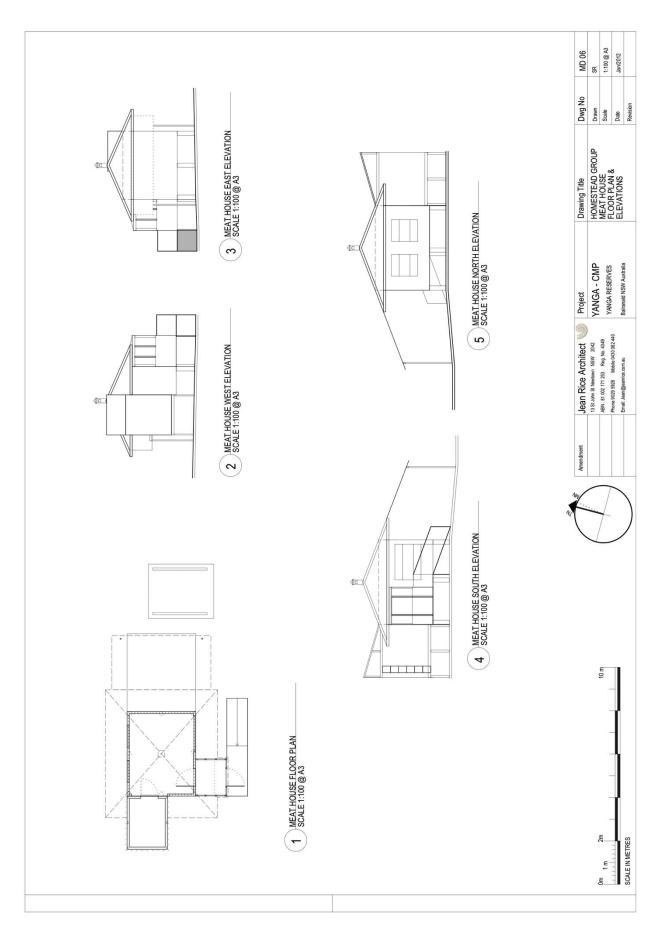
Homestead Group Meat House floor plan & elevations and elevations. Jean Rice Architect, site assessment 2009.
